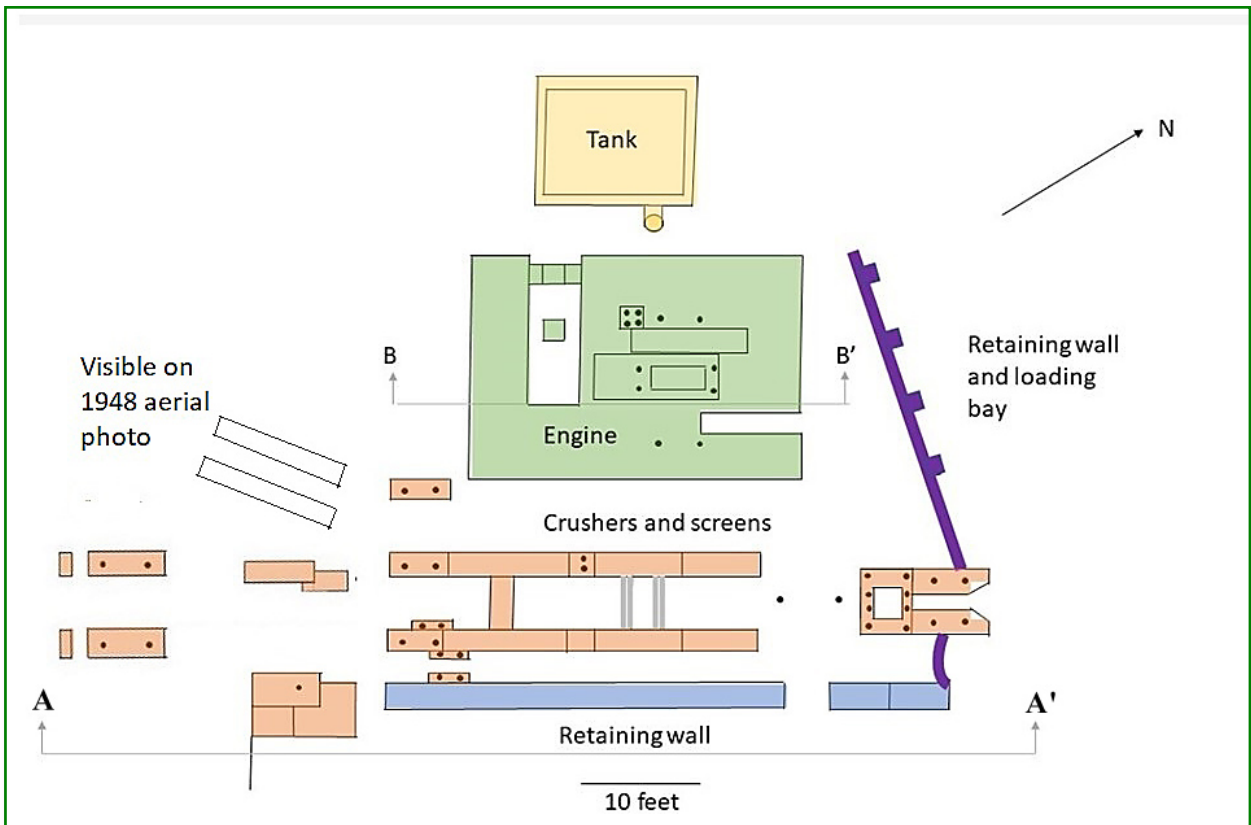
Plan of crusher plant; individual elements are colour-coded.
